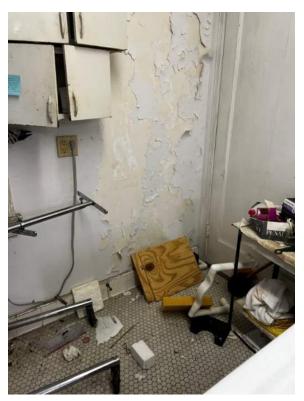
IMG_1183 - Interior 1st Floor, North West corner of Prep Room – significant water damage for full height of interior corner and ceiling.
